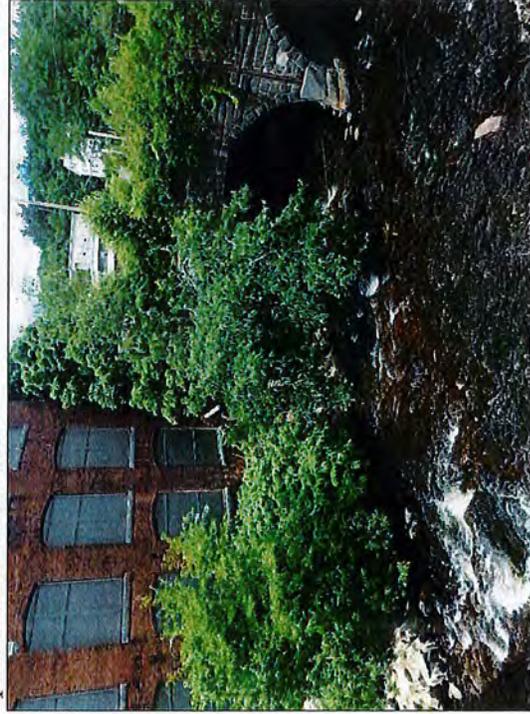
Kimball Street: Heaving vegetation on downstream left bank and railroad bridge.
